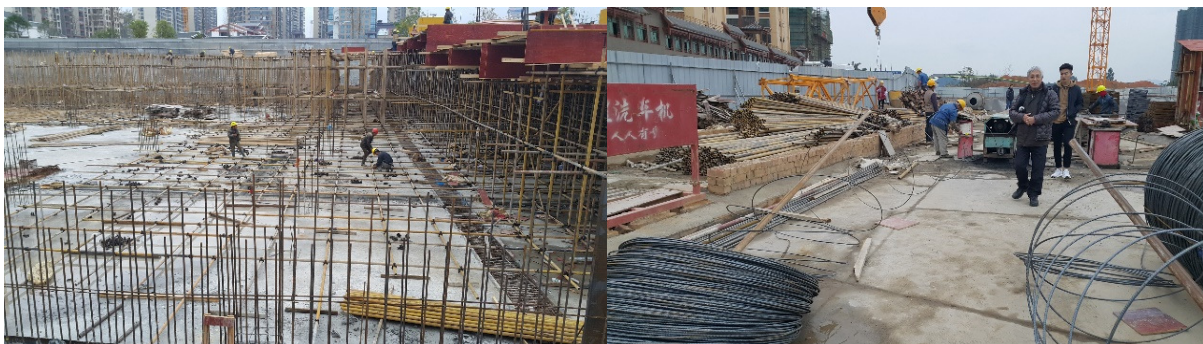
Workers was working on steel falsework; Figure 6b Worker processing rebar from a roll
